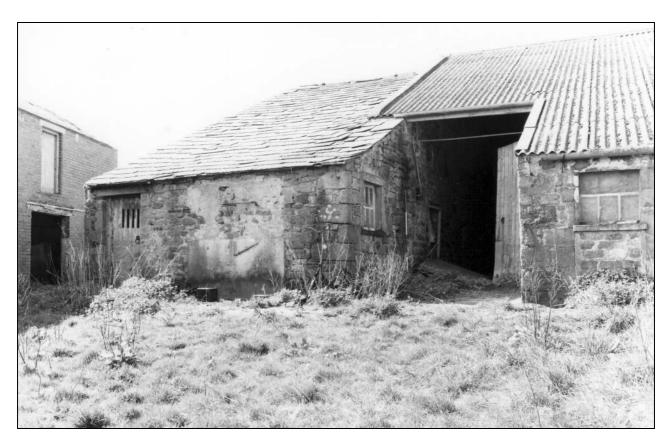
South extension, and new cart entry to south-east corner of aisled barn
